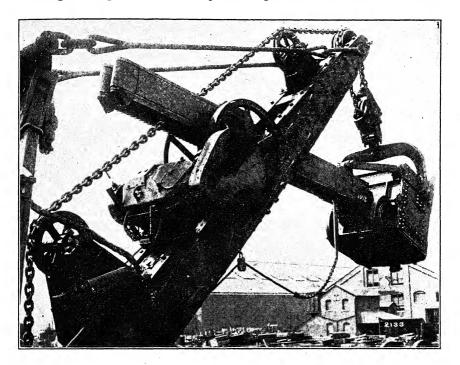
30-h.p. Series Motor and Controller Operating the Thrust on a 65-ton Electric Shovel.
